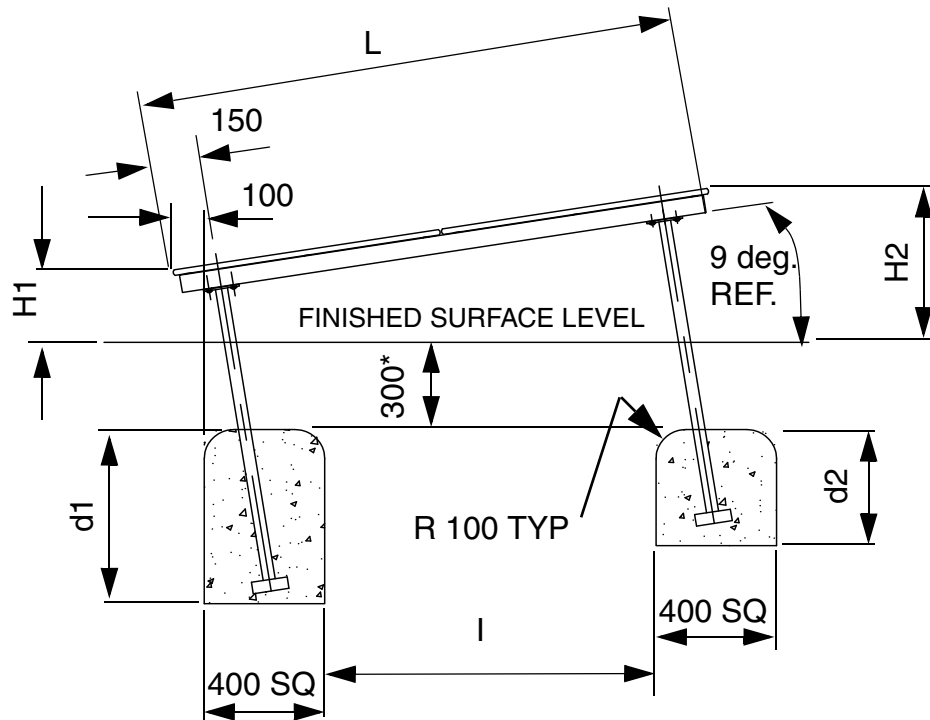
LOOSE FILL INSTALLATION - PCBALE SLOPED
